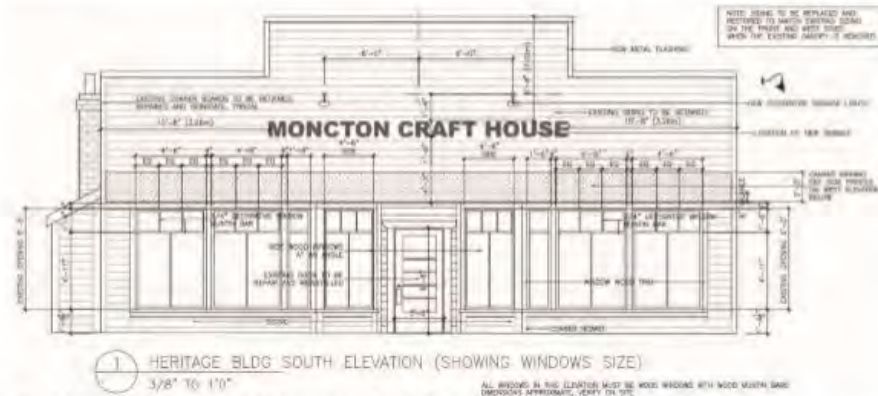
Proposed South Elevation, Ikeda Dry Goods
